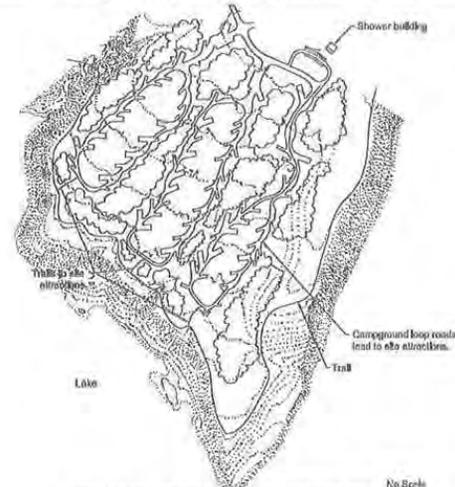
Loop roads lead to the lake. The campground loop roads fit between existing vegetation and drainages.
